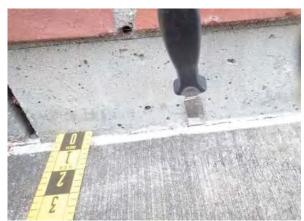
Depicts flat probe easily inserted into a cohesively failed sealant joint of the expansion joint.
